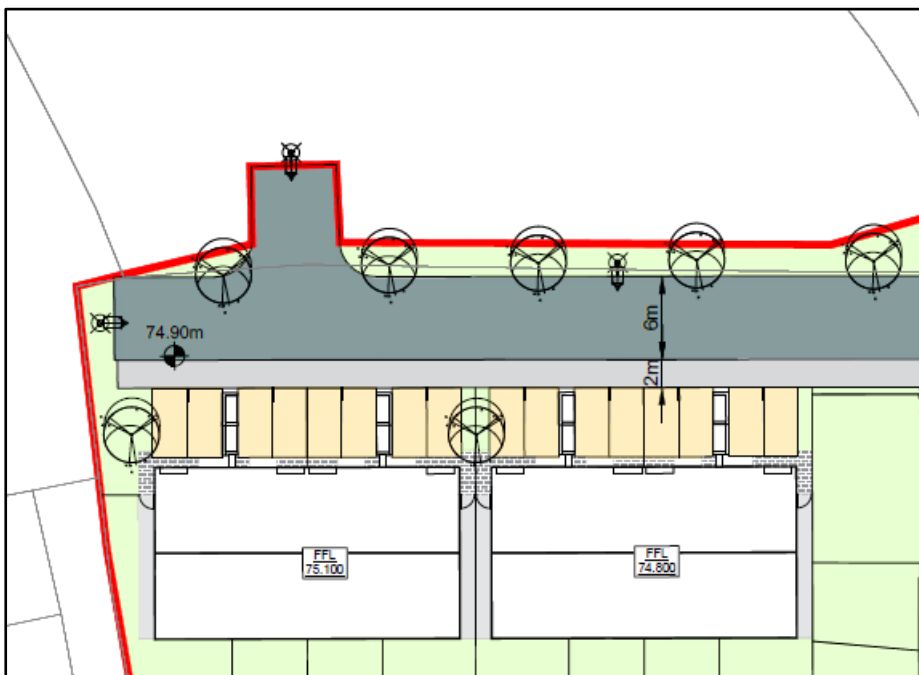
Single sided proposed off-street perpendicular parking accessed from an estate road in the northwest of the development (Source: ORS Drawing 241139-ORS-ZZ-00-DR-TR-700)
